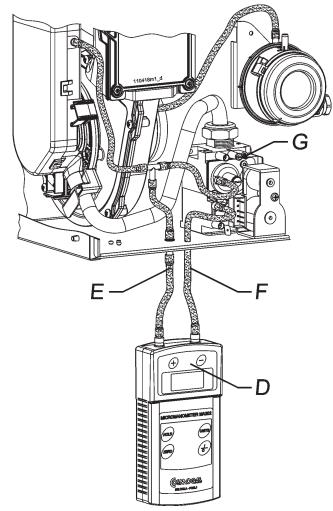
Differential pressure gauge connections to checking the combustion air pressure
